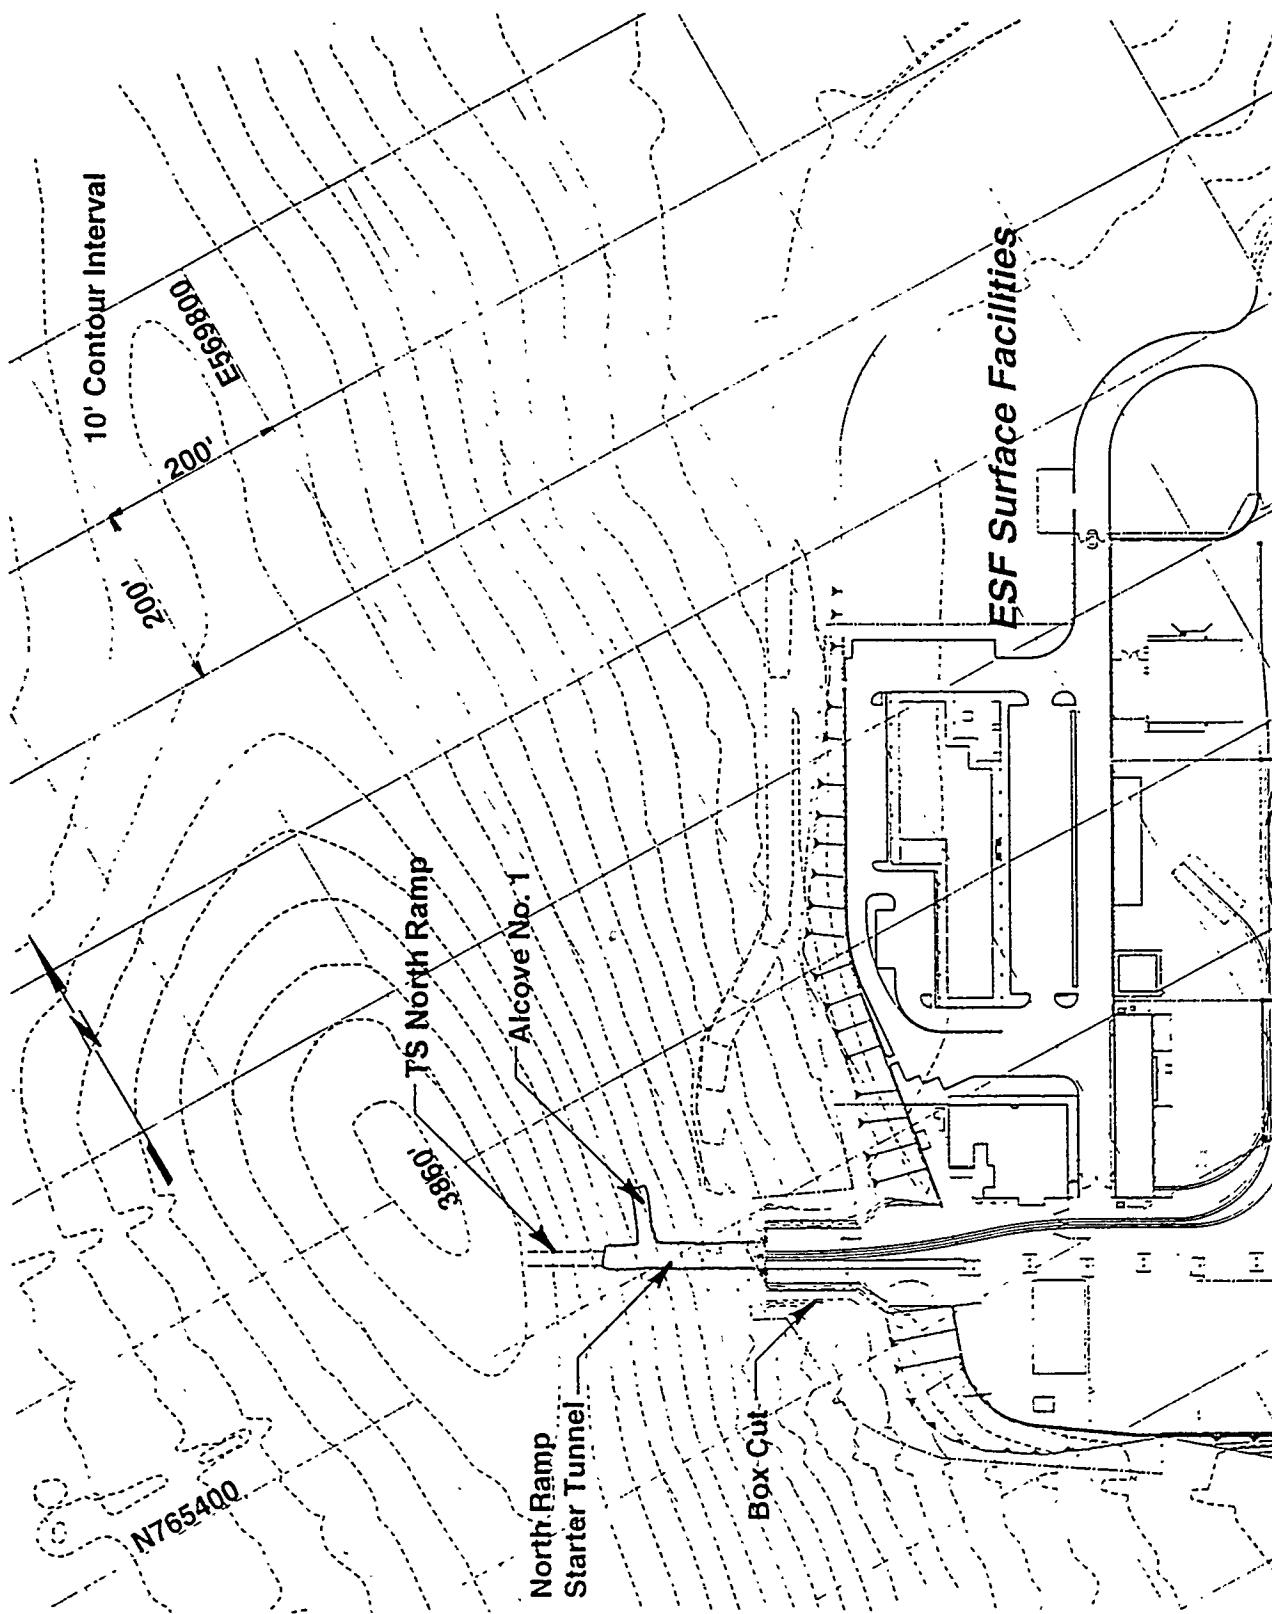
Plan drawing of the ESF surface facilities and NRST.
